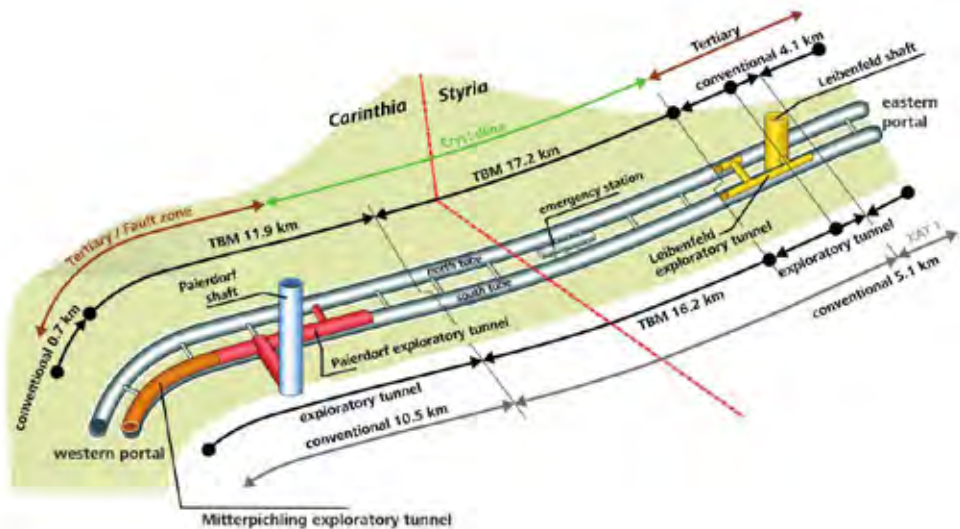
Schematic layout showing the exploration tunnels and shafts, running tunnels, cross-passages and emergency stopping area as well as the sub-division of the main contracts KAT 1, KAT 2 and KAT 3
